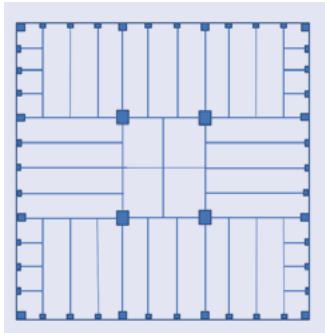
Approximated plan view showing 46 perimeter columns and 4 interior columns.
